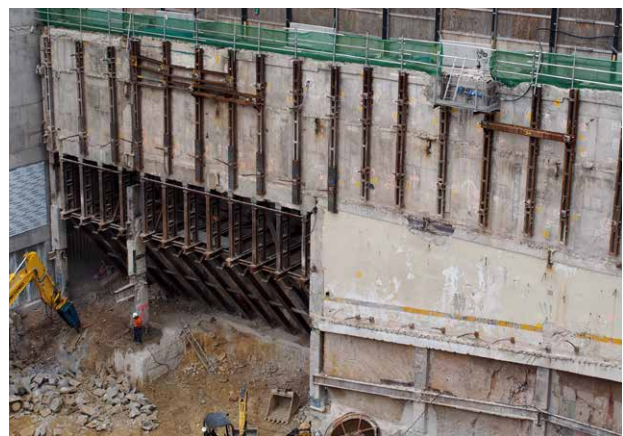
Shoring and ground anchoring placed with the *road* reservation to support *roads* adjoining excavations require the *approval* of the *City*. Excavations must also be protected using appropriate pedestrian and traffic barriers (see 4.5.3)
